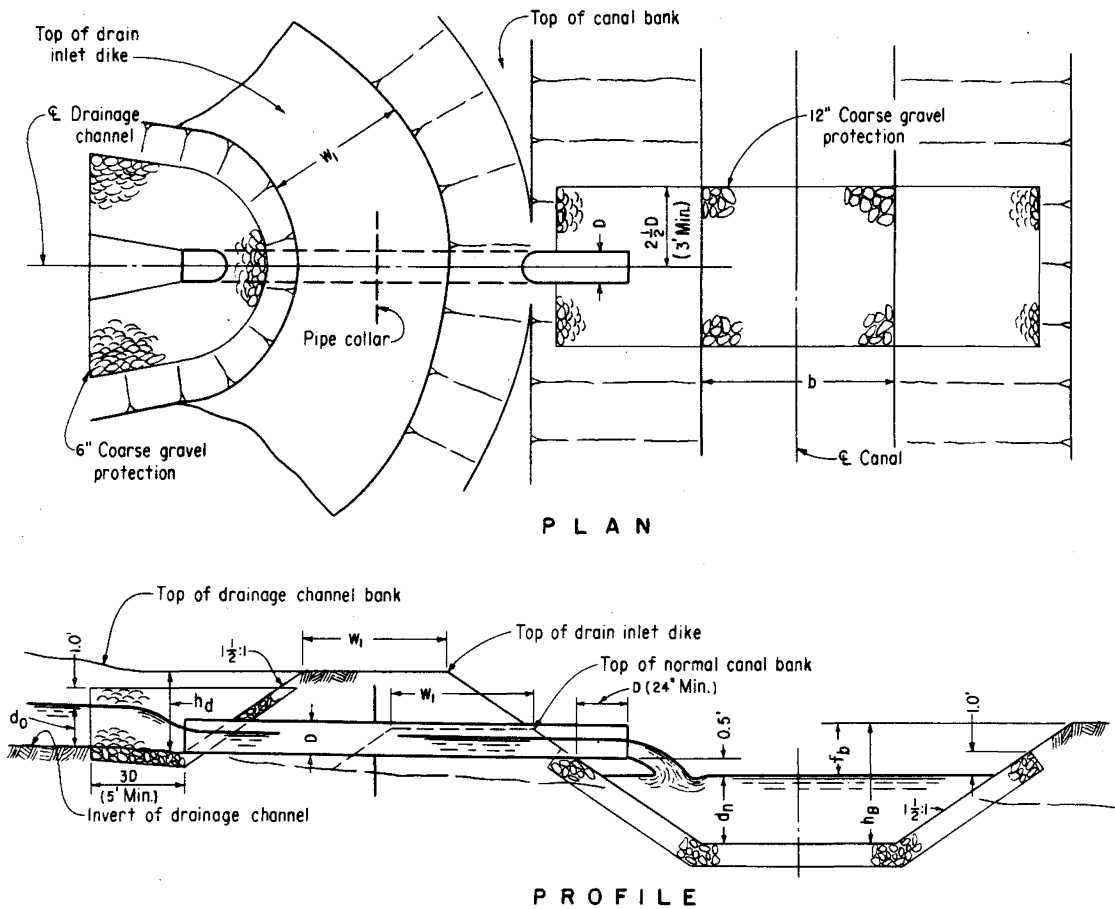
Pipe drain inlet—plan, profile, and nomenclature. 103-D-1315
